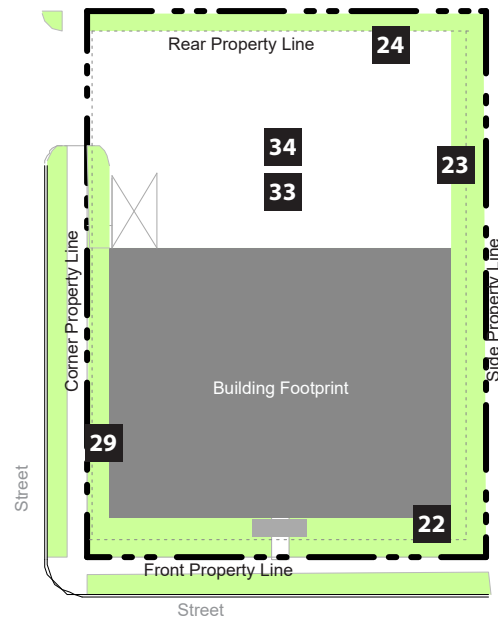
Civic building siting diagram shown with side vehicular access and tower at entry. Not to scale.
